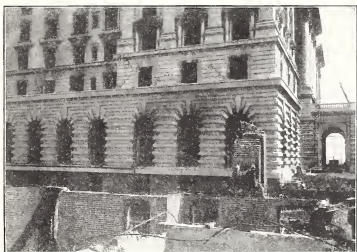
Fairmont Hotel; North Front, Showing Earthquake Cracks in the Terra-Cotta Veneer of the Second Story Walls.
